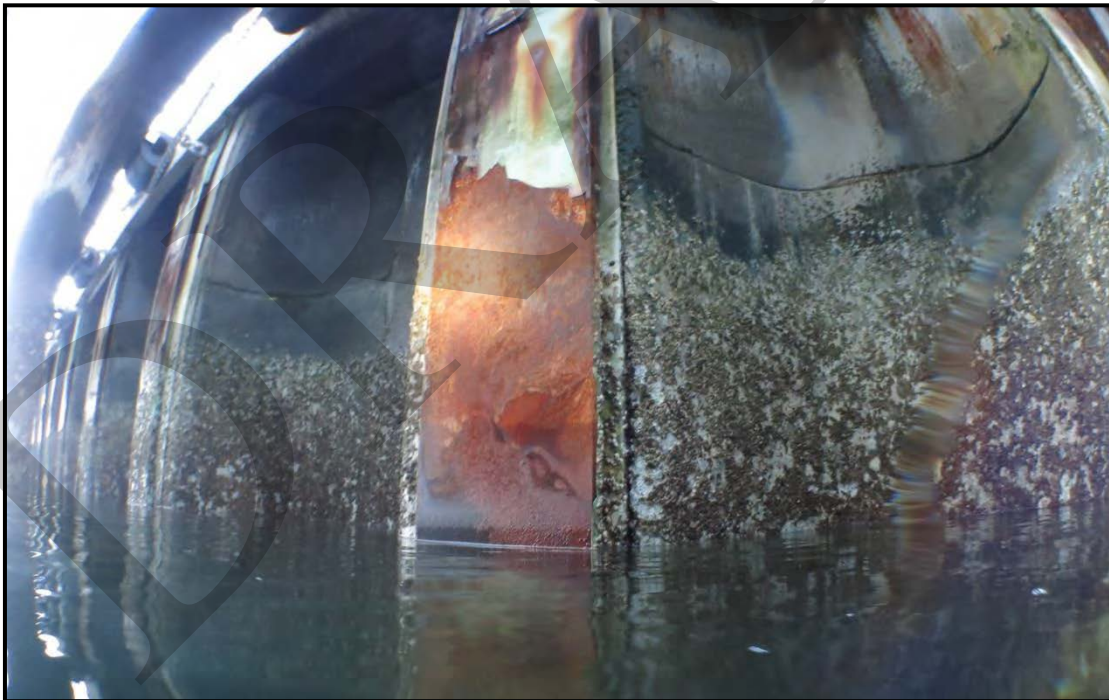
Coating loss and corrosion on steel king pile at Pier 1.
